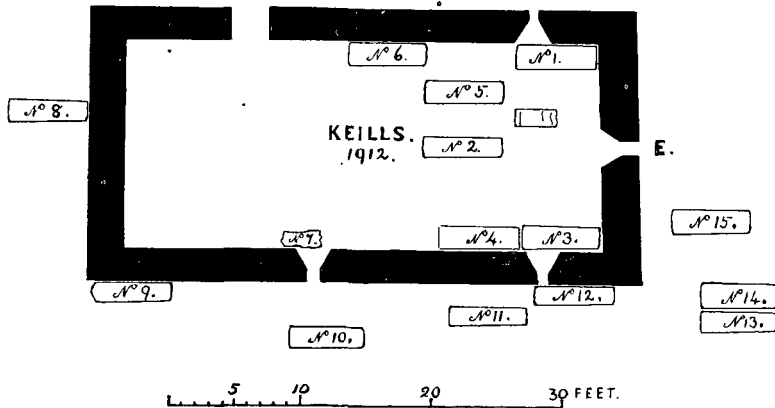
Plan of Church and Sculptured Slabs at Keills.
